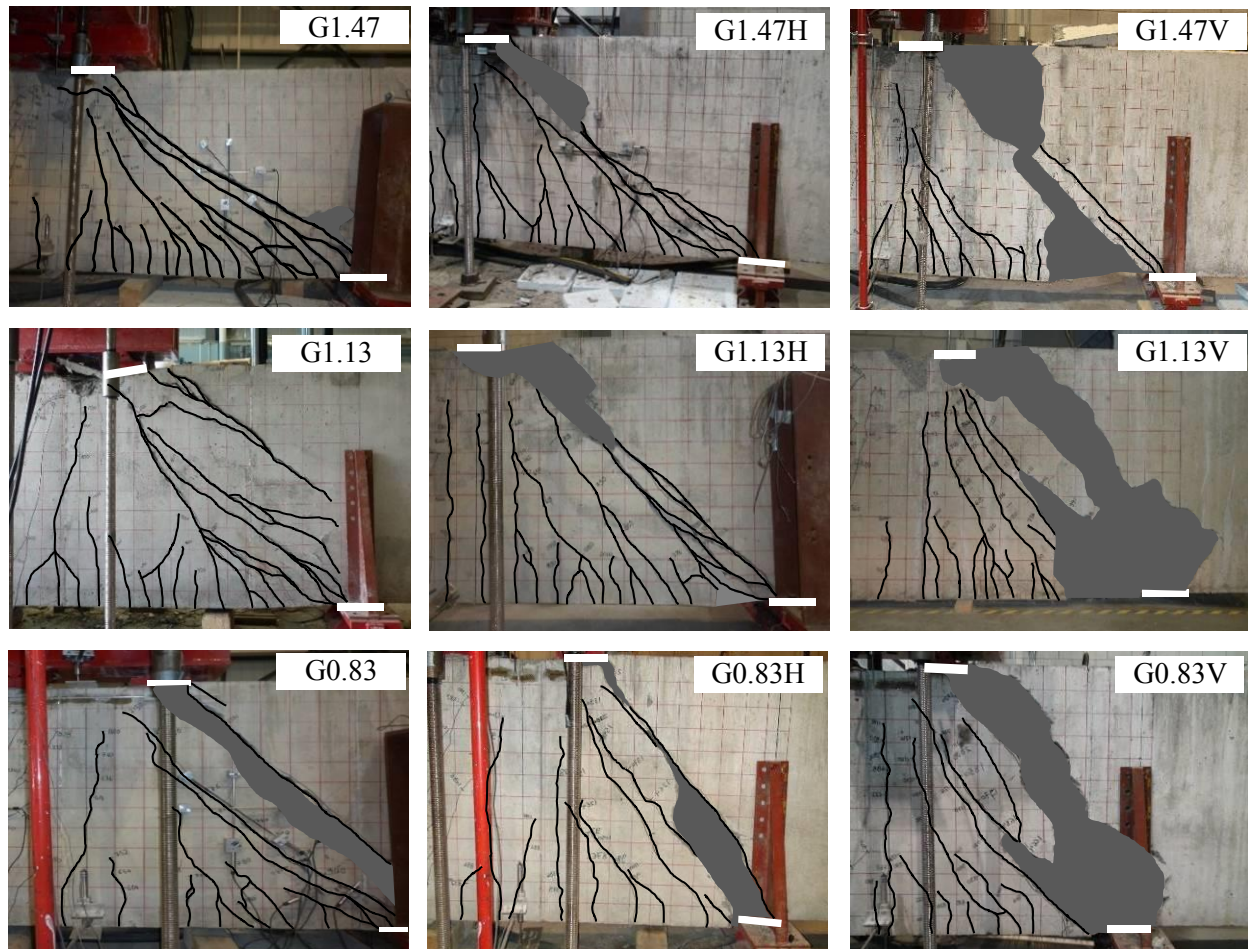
Mode of failure of all tested specimens (Shaded area indicates crushed concrete)
